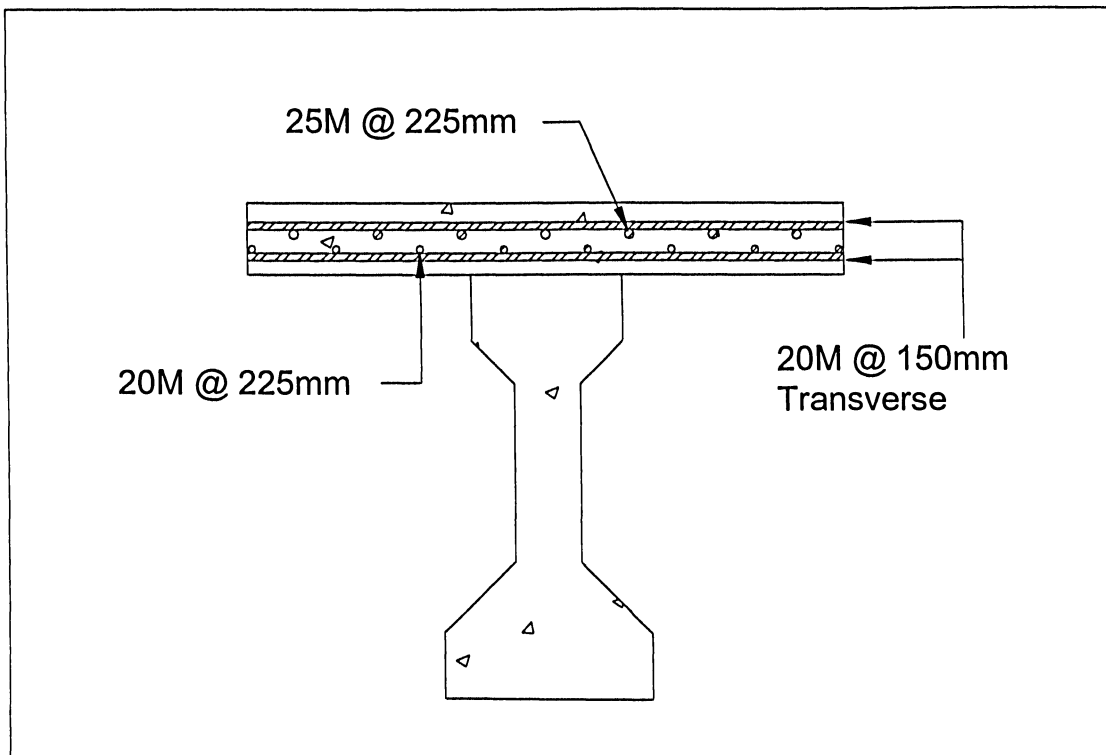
AASHTO Type III girder slab reinforcement details
